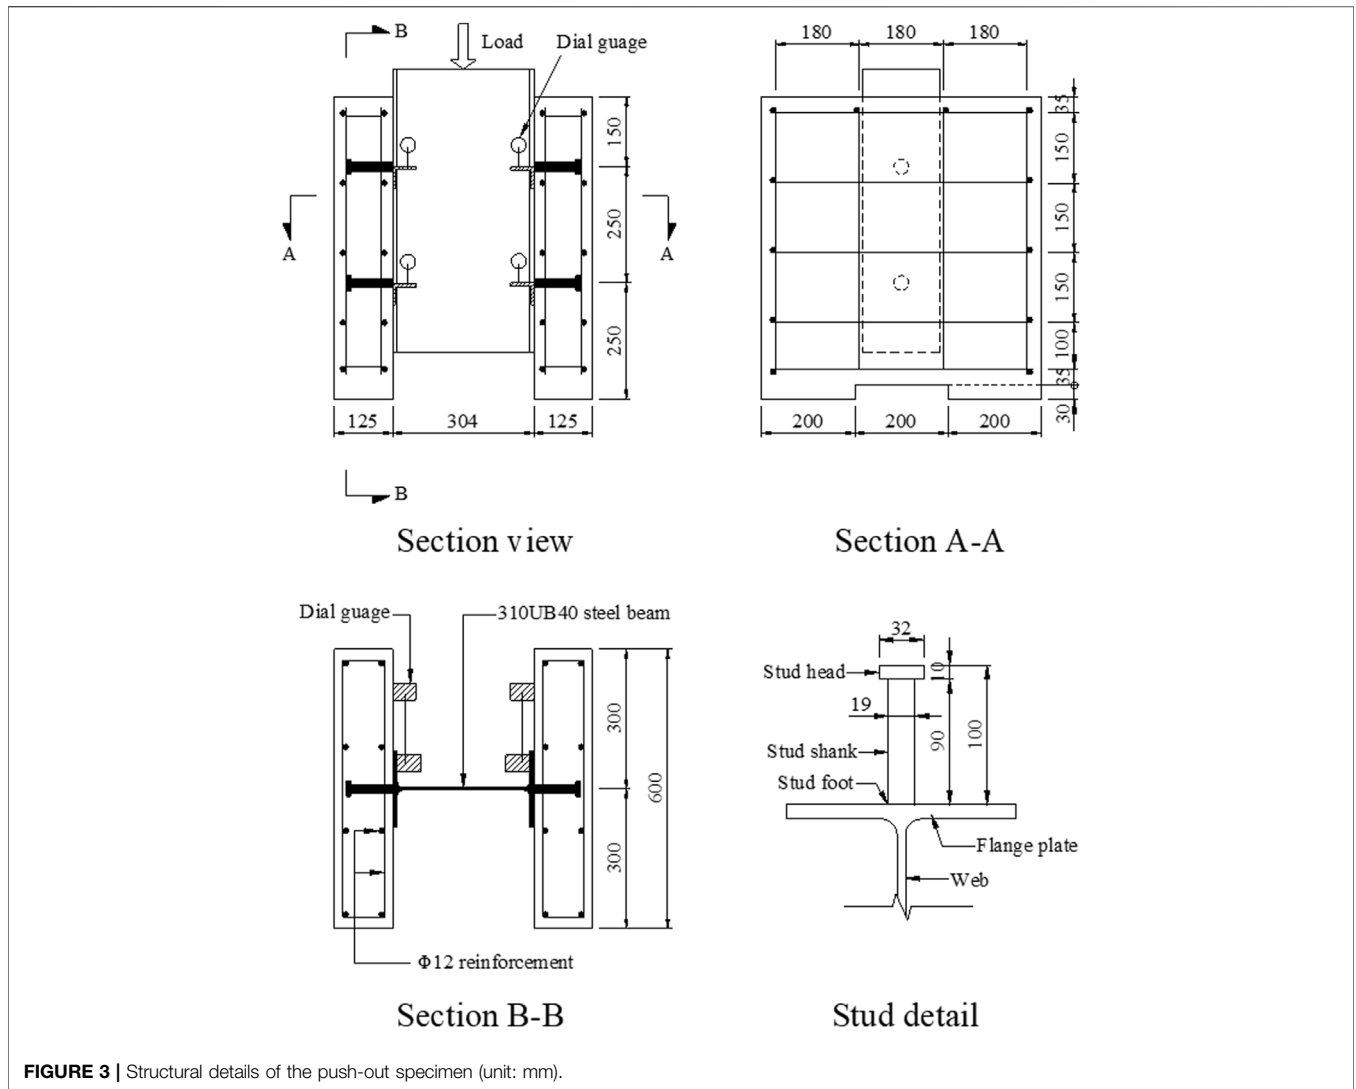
| Structural details of the push-out specimen (unit: mm).
